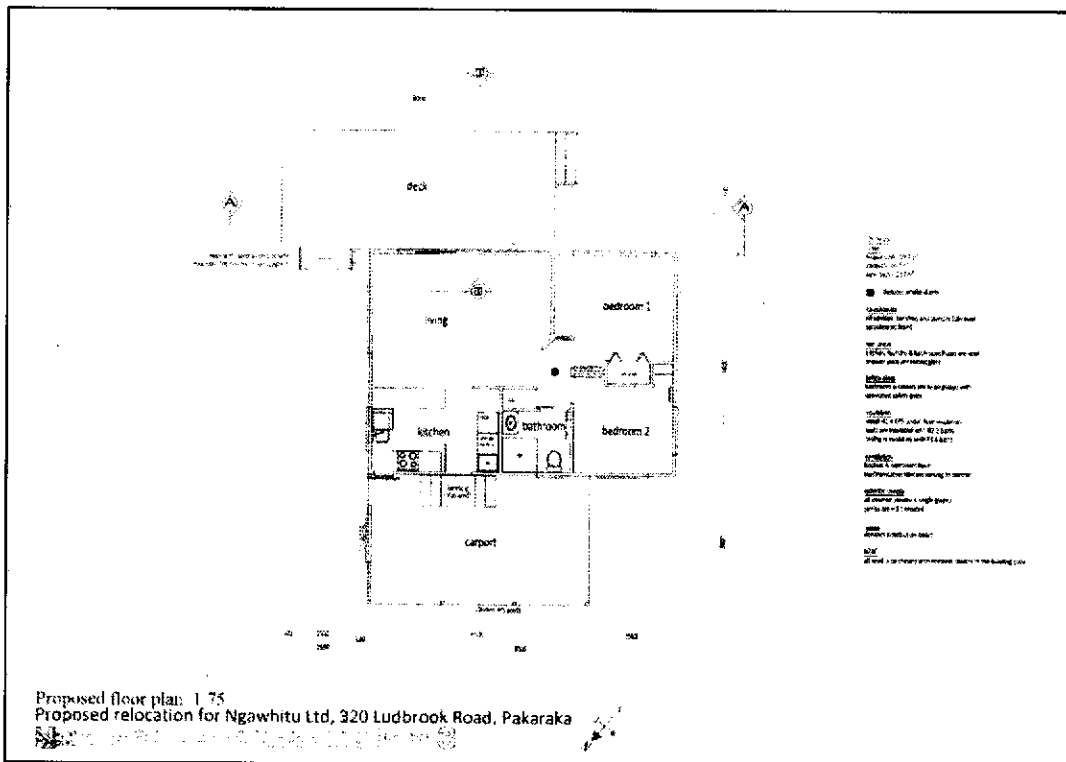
Proposed residential dwelling proposed for 320 Ludbrook Rd (Cadplanz 2023).
